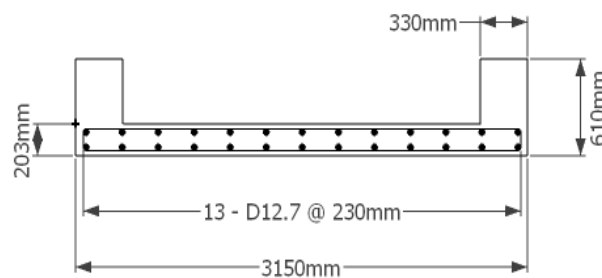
Dimensions and reinforcing for longitudinal walls.
